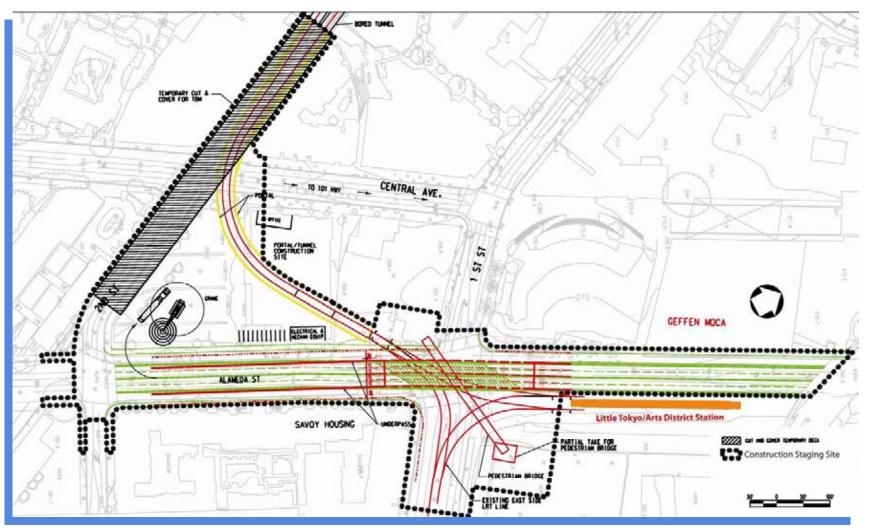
1<sup>st</sup> Street Underpass (Underground Emphasis LRT Alternative)
